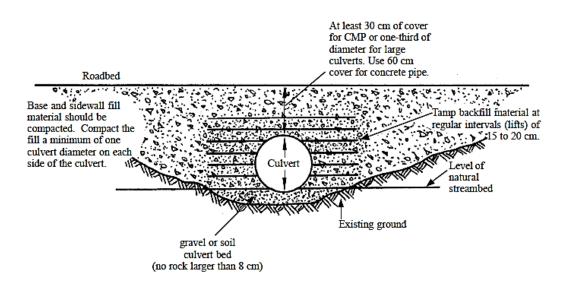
Culvert Backfill and Compaction (Keller 2003)
